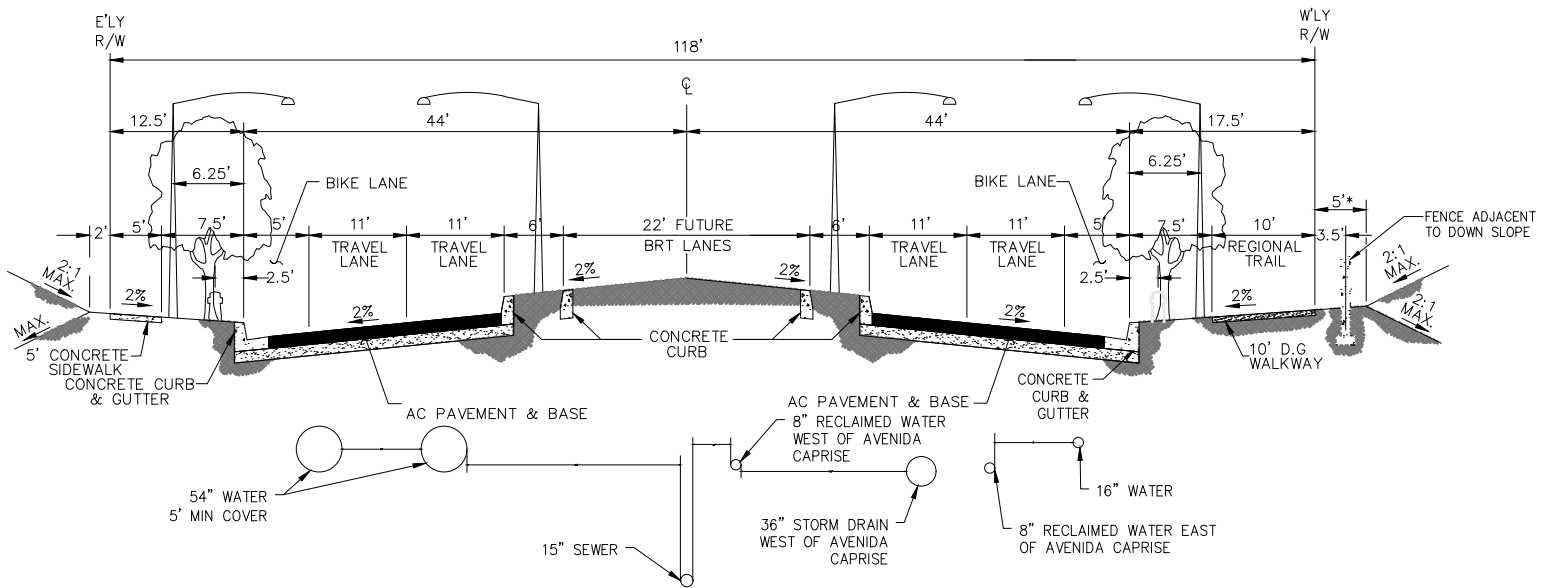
Two Way La Media Parkway (TM Street Section 10)
